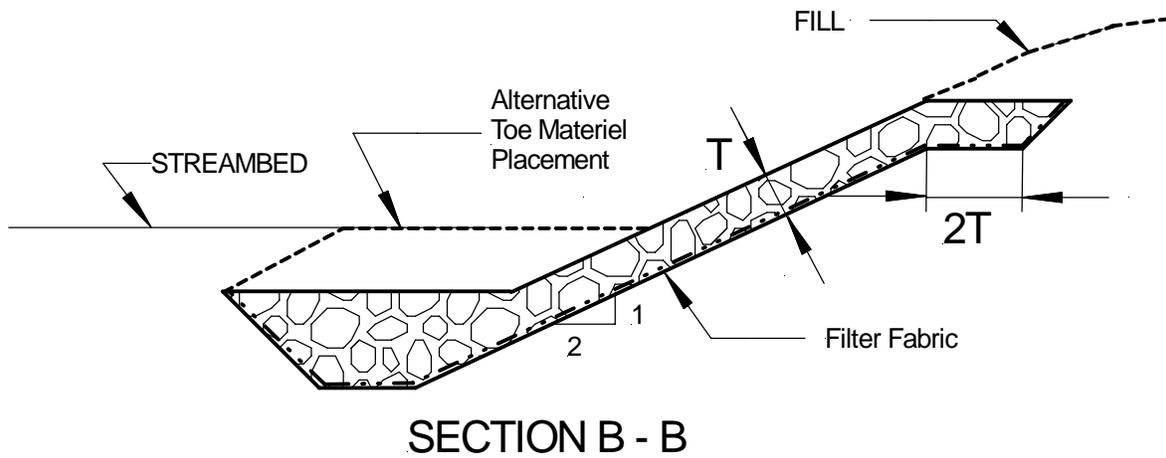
Typical Riprap Installation: End View (Bank Protection Only)
